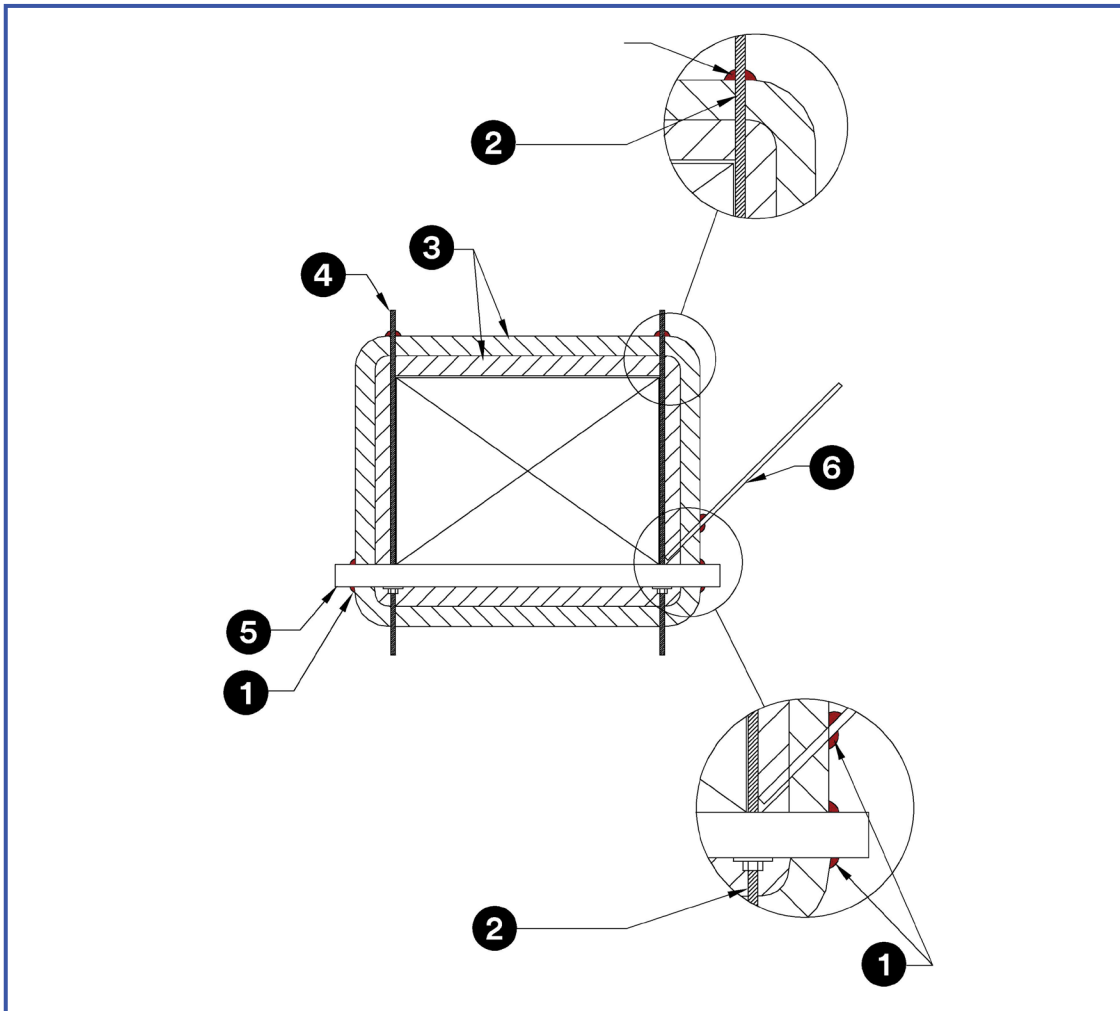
Hanger penetrations of wrap envelope for ventilation duct systems
